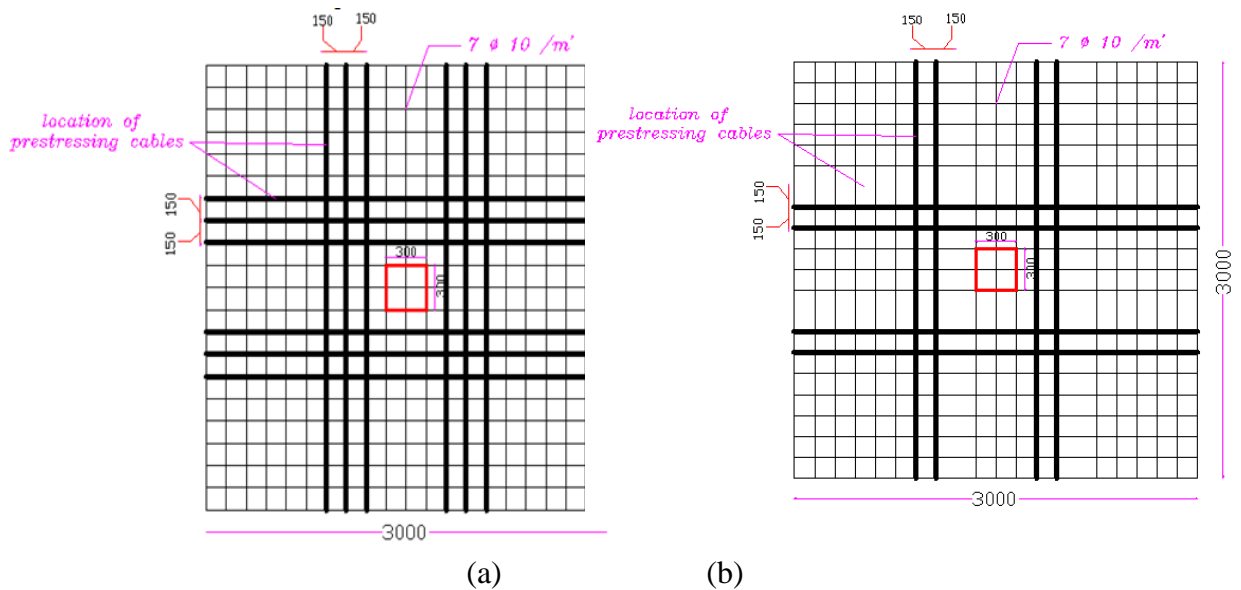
Details of Arrangement of Cables in Two Directions(a), Details of arrangement of cables in two directions (b).
